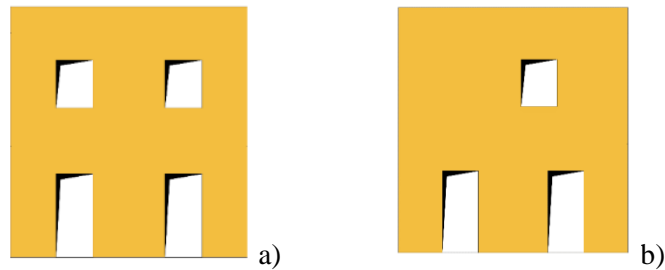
Example of: a) *regular* masonry wall and b) *irregular* masonry wall.
